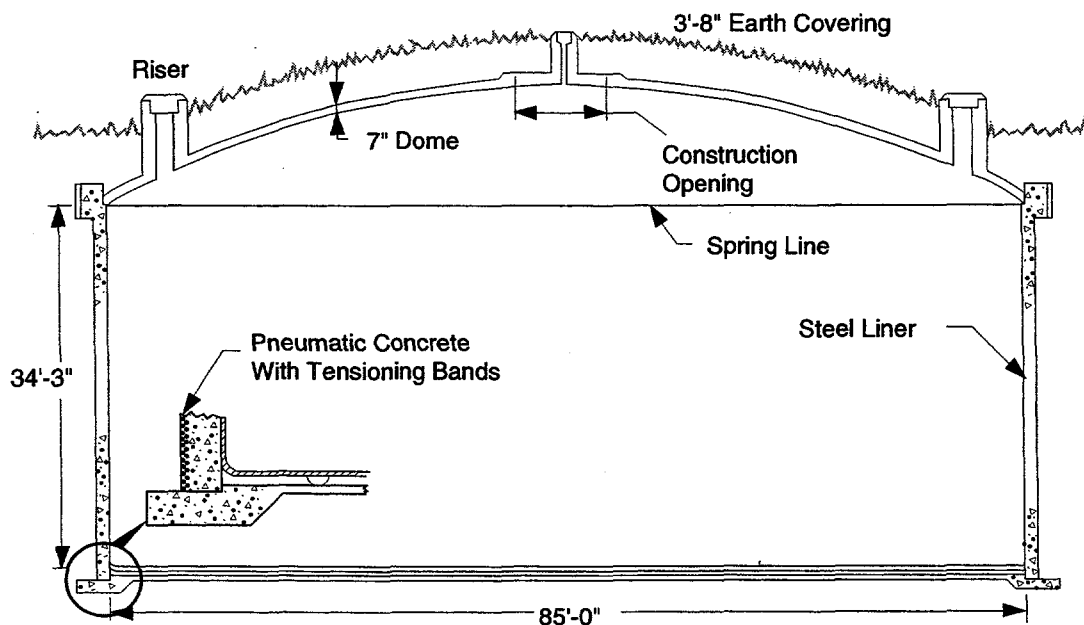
Uncooled Waste Storage Tank, Type IV (Prestressed Concrete Walls, 1,300,000 Gallons).
